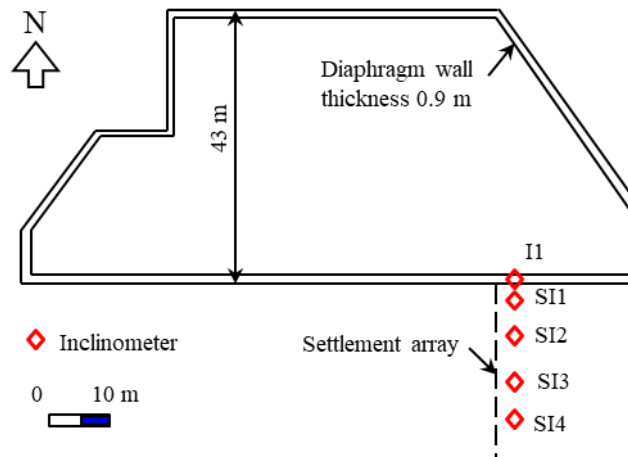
Instrumentation layout of the Taipei National Enterprise Center (TNEC) excavation
